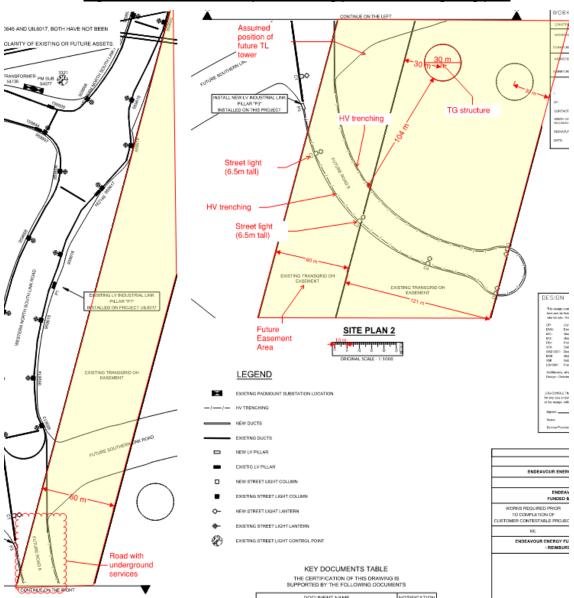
Endeavour Site plan detailing placement of Lighting pole
